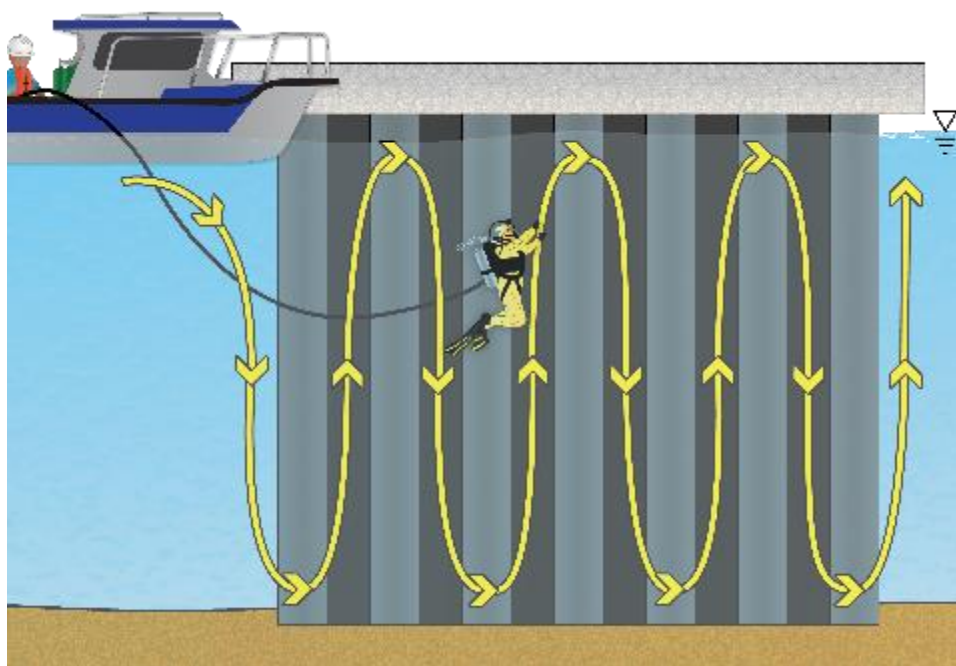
Illustration. Inspection pattern of steel sheet pile bulkhead.
